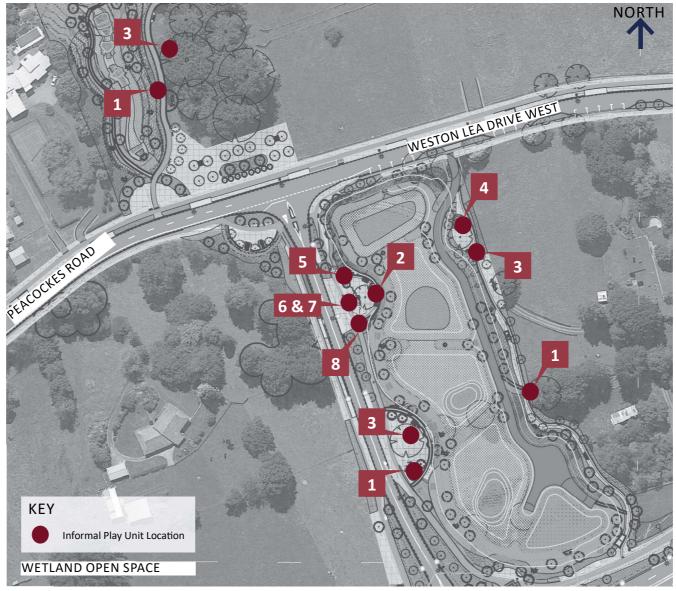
WETLAND PARK AND STORMWATER OUTLET PARK PLAY INSTALLATIONS
